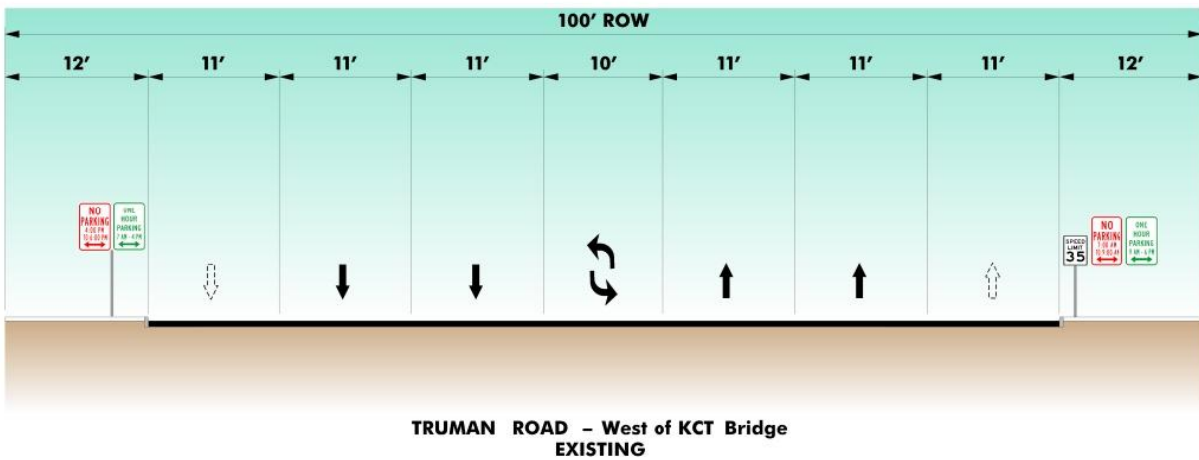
Regional Rail Typical Section on Truman Road - West of KCT Bridge - Existing Conditions
